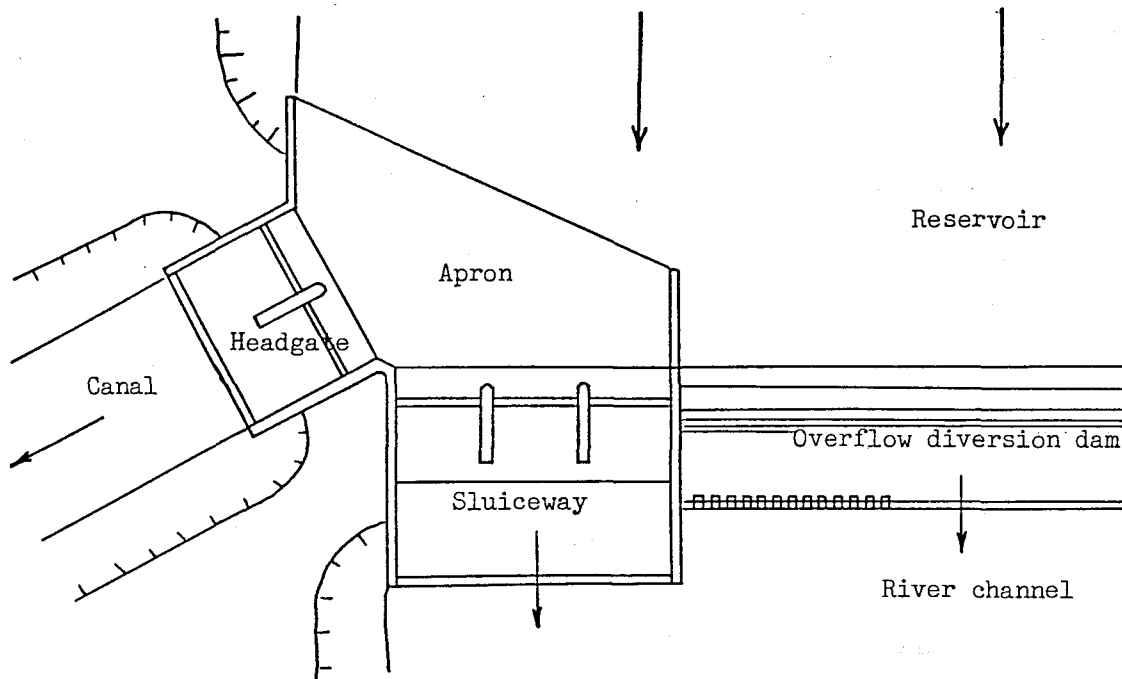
Layout for Diversion Dam, Sluiceway, and Headgate
